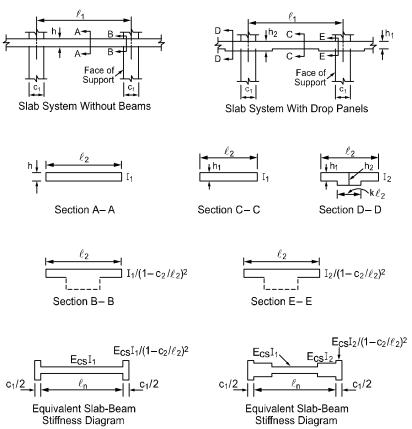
Sections for calculating slab-beam stiffness,  $K_{sb}$
